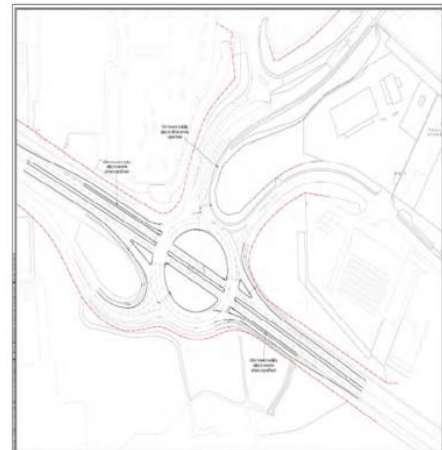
c Fishbourne Road Roundabout Improvement – Preferred Approach
